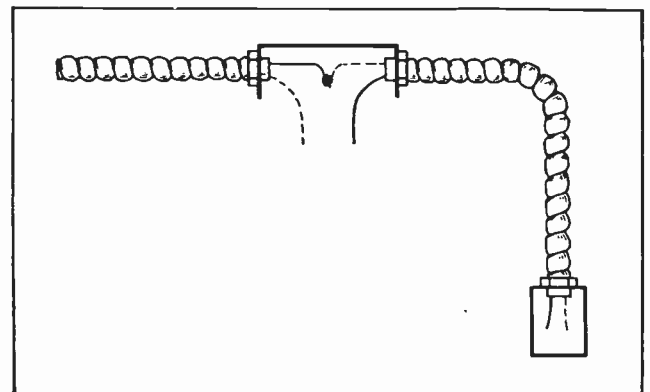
B. This sketch shows the manner in which the white and black wires in a polarized system are connected at the outlet boxes for ceiling lights and wall switches.
